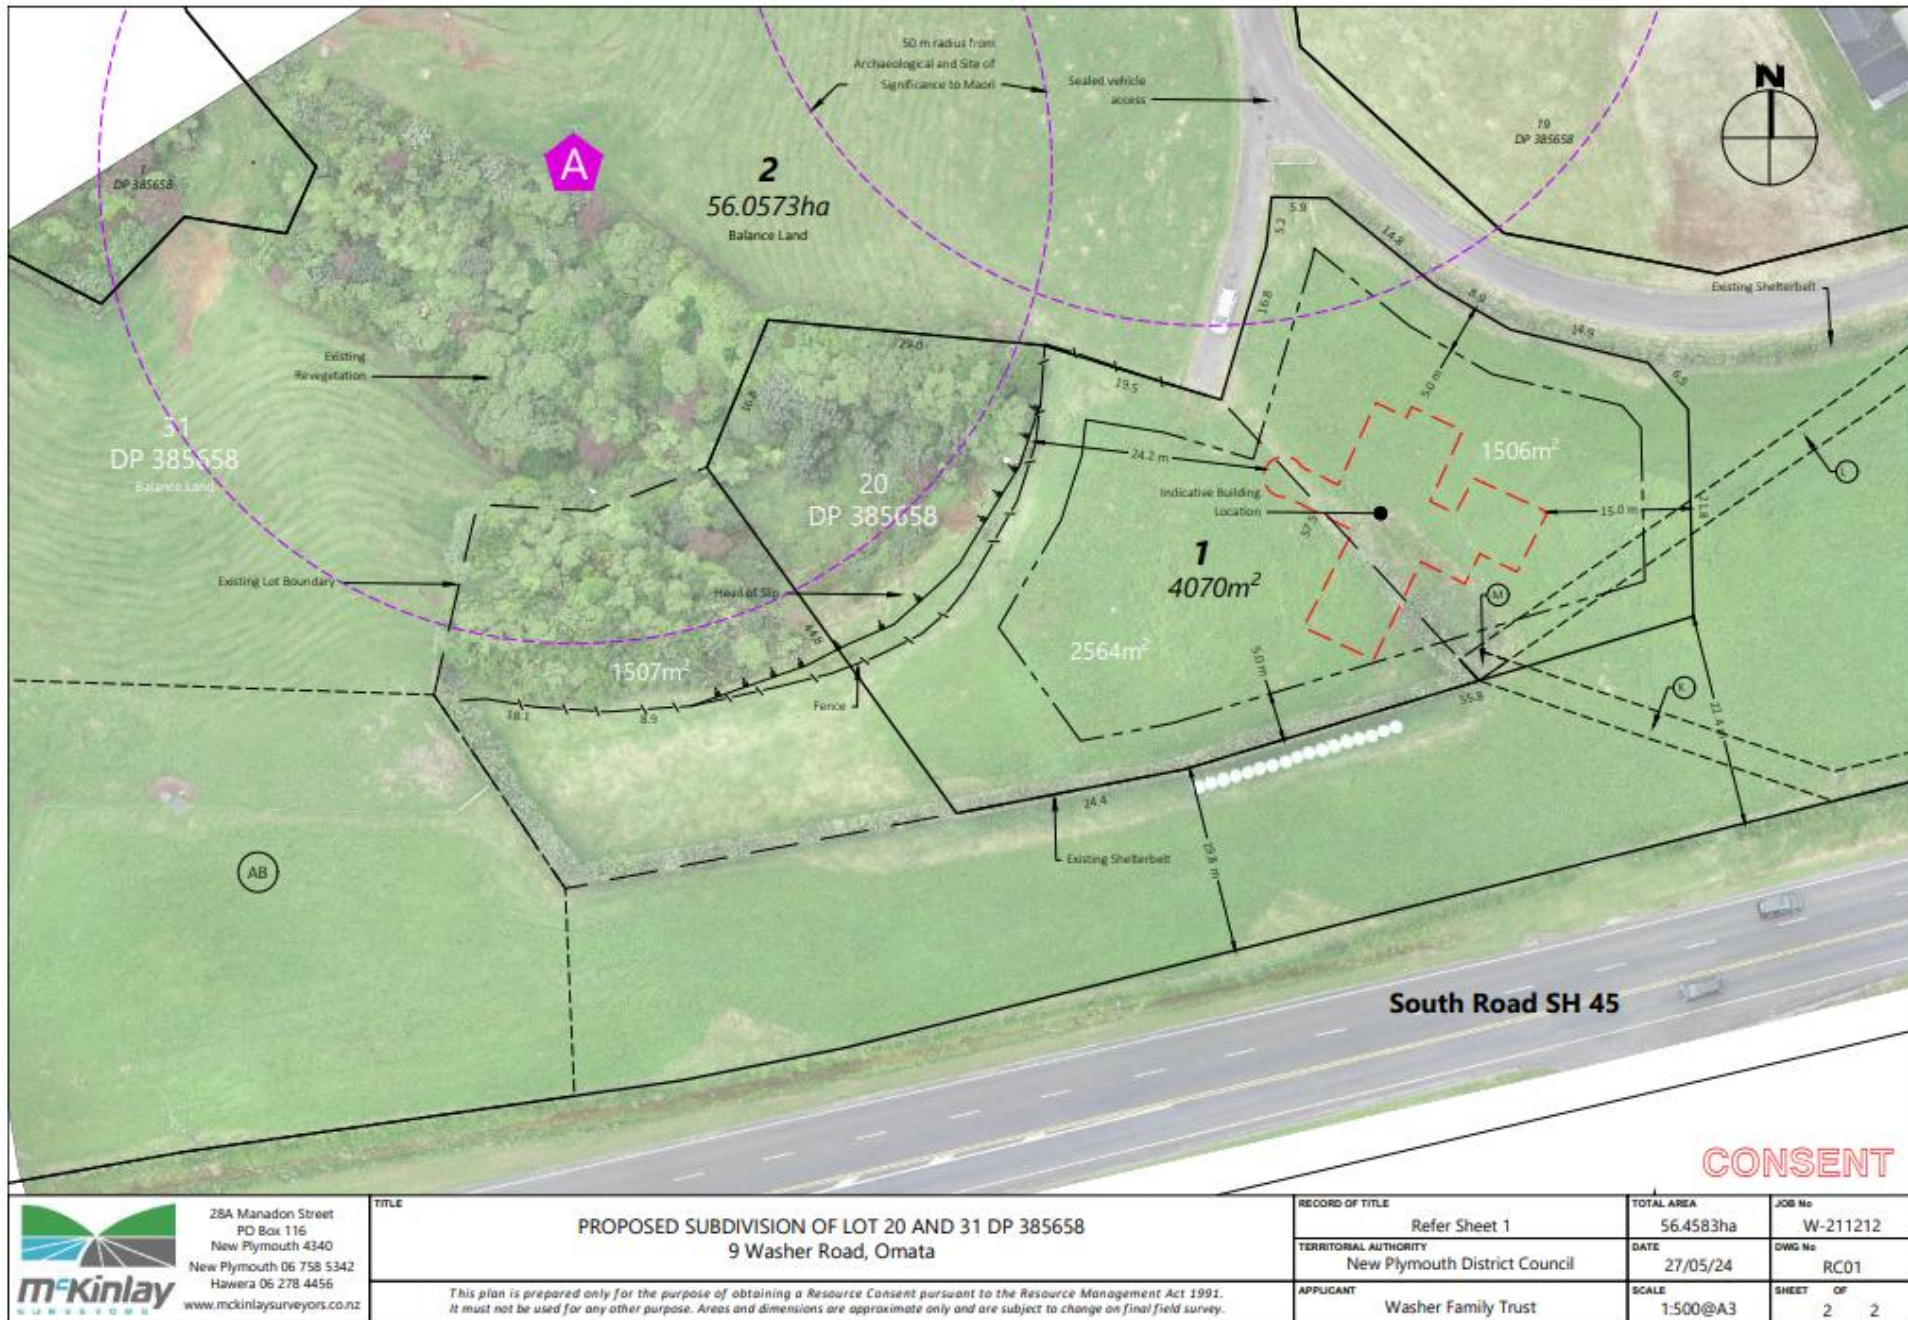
Proposed Site Plan. Source: McKinlay Surveyors.
